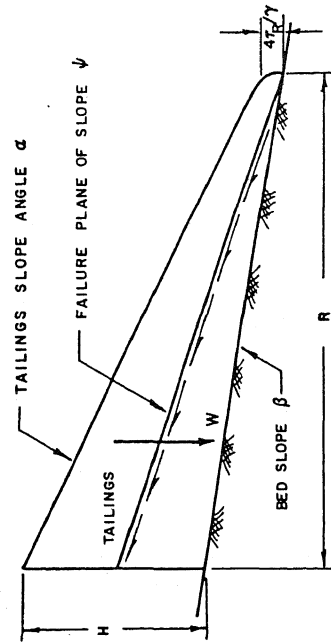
(b) - CROSS SECTION OF CONE SEGMENT
